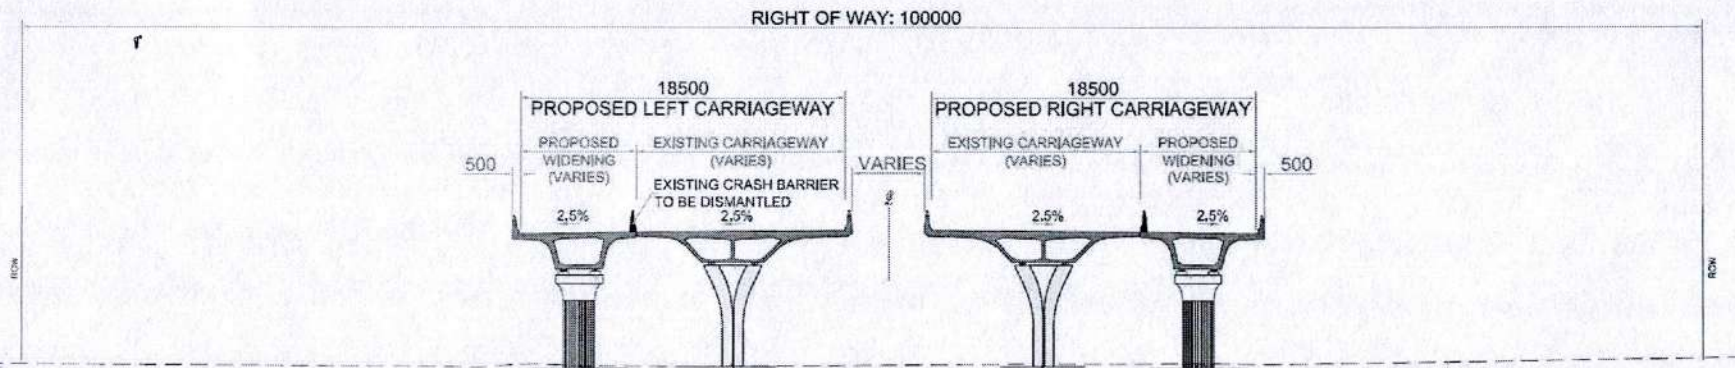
Typical cross section at Tumakuru Road & Hosur Road Flyover Portion
